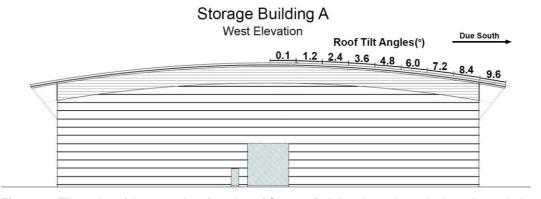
Tilt angles of the curved roof section of Storage Building A used to calculate glint and glare
